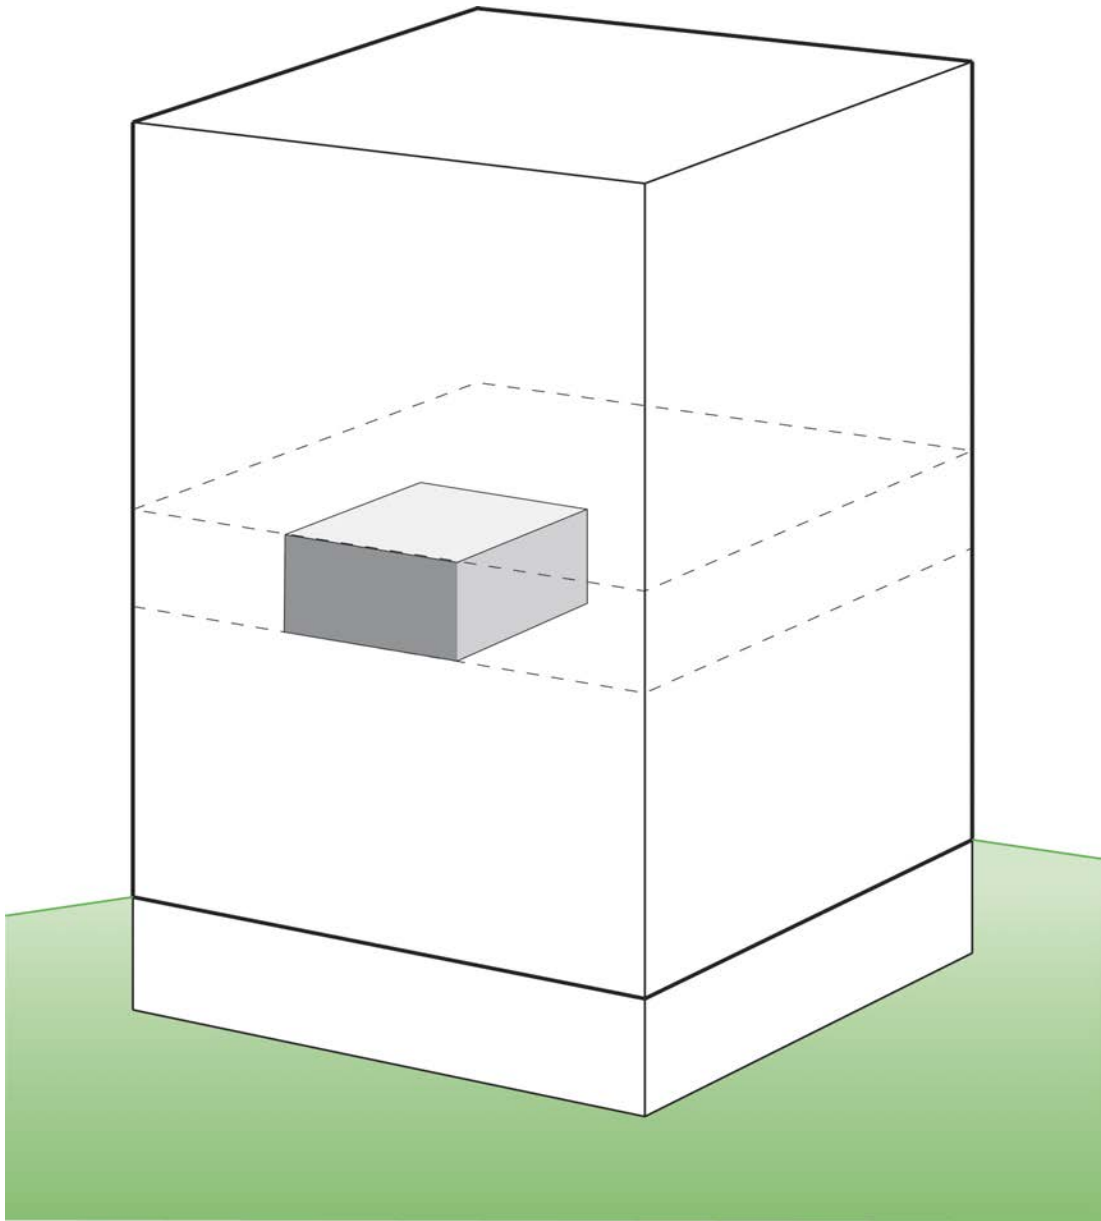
Multi-storey building with floor spaces isolated from vertical shafts
